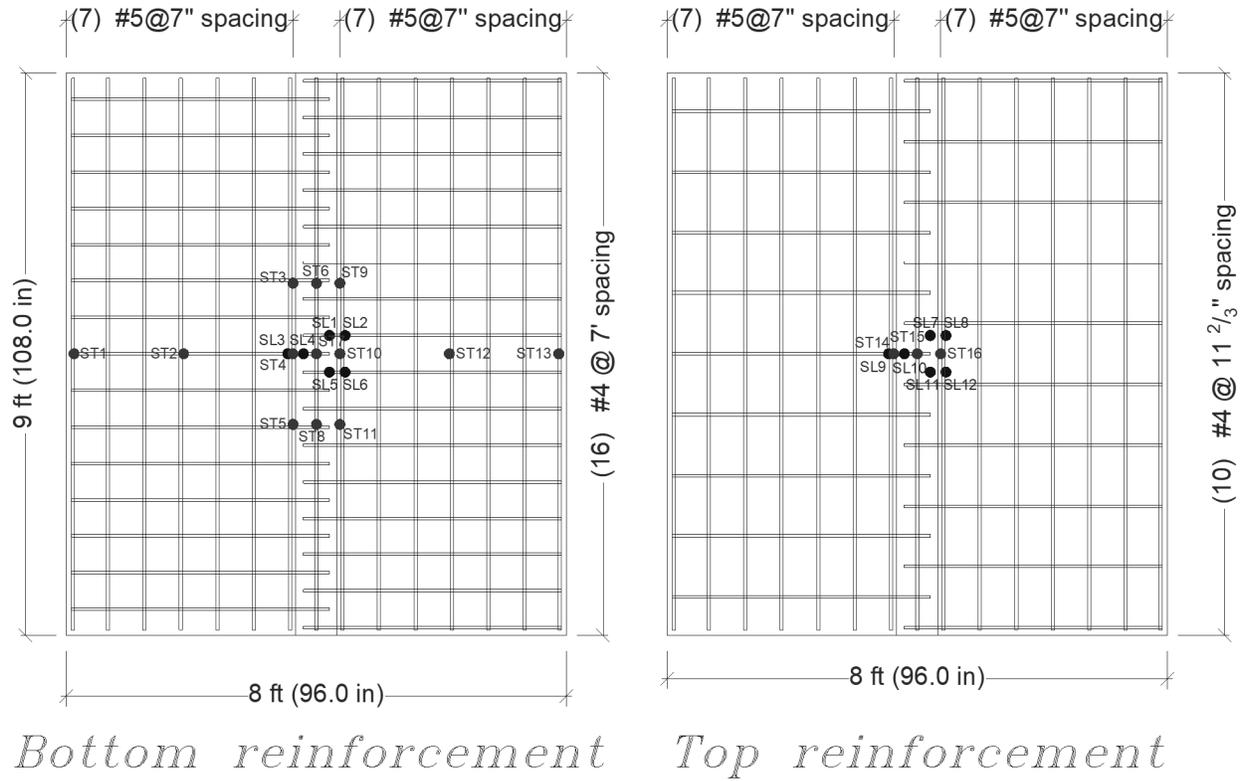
Structural details and instrumentation plan for the third transverse specimen (SP-3).
